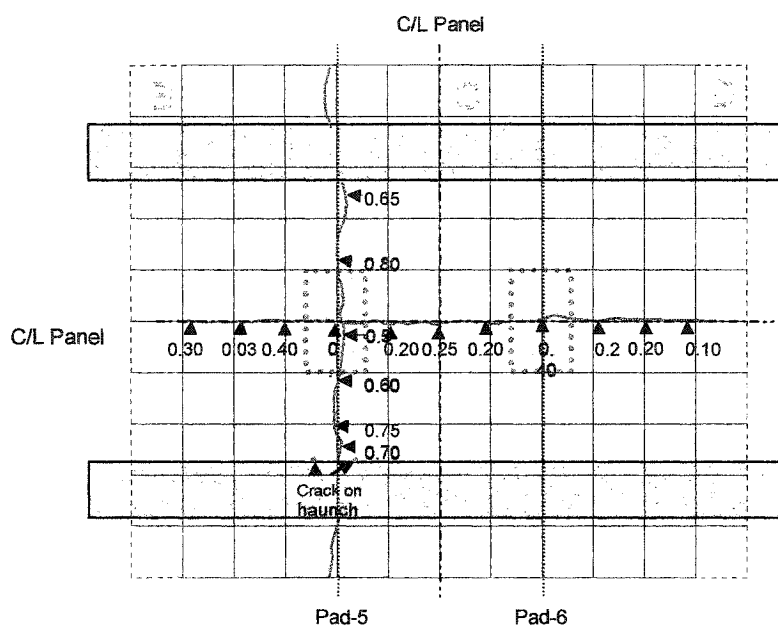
Panel C: Crack Pattern on Soffit after 100 Load Cycles
